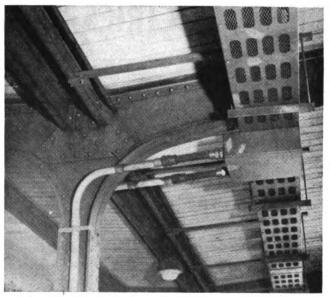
A section of the duct showing a tap box and two branch circuit conduits
